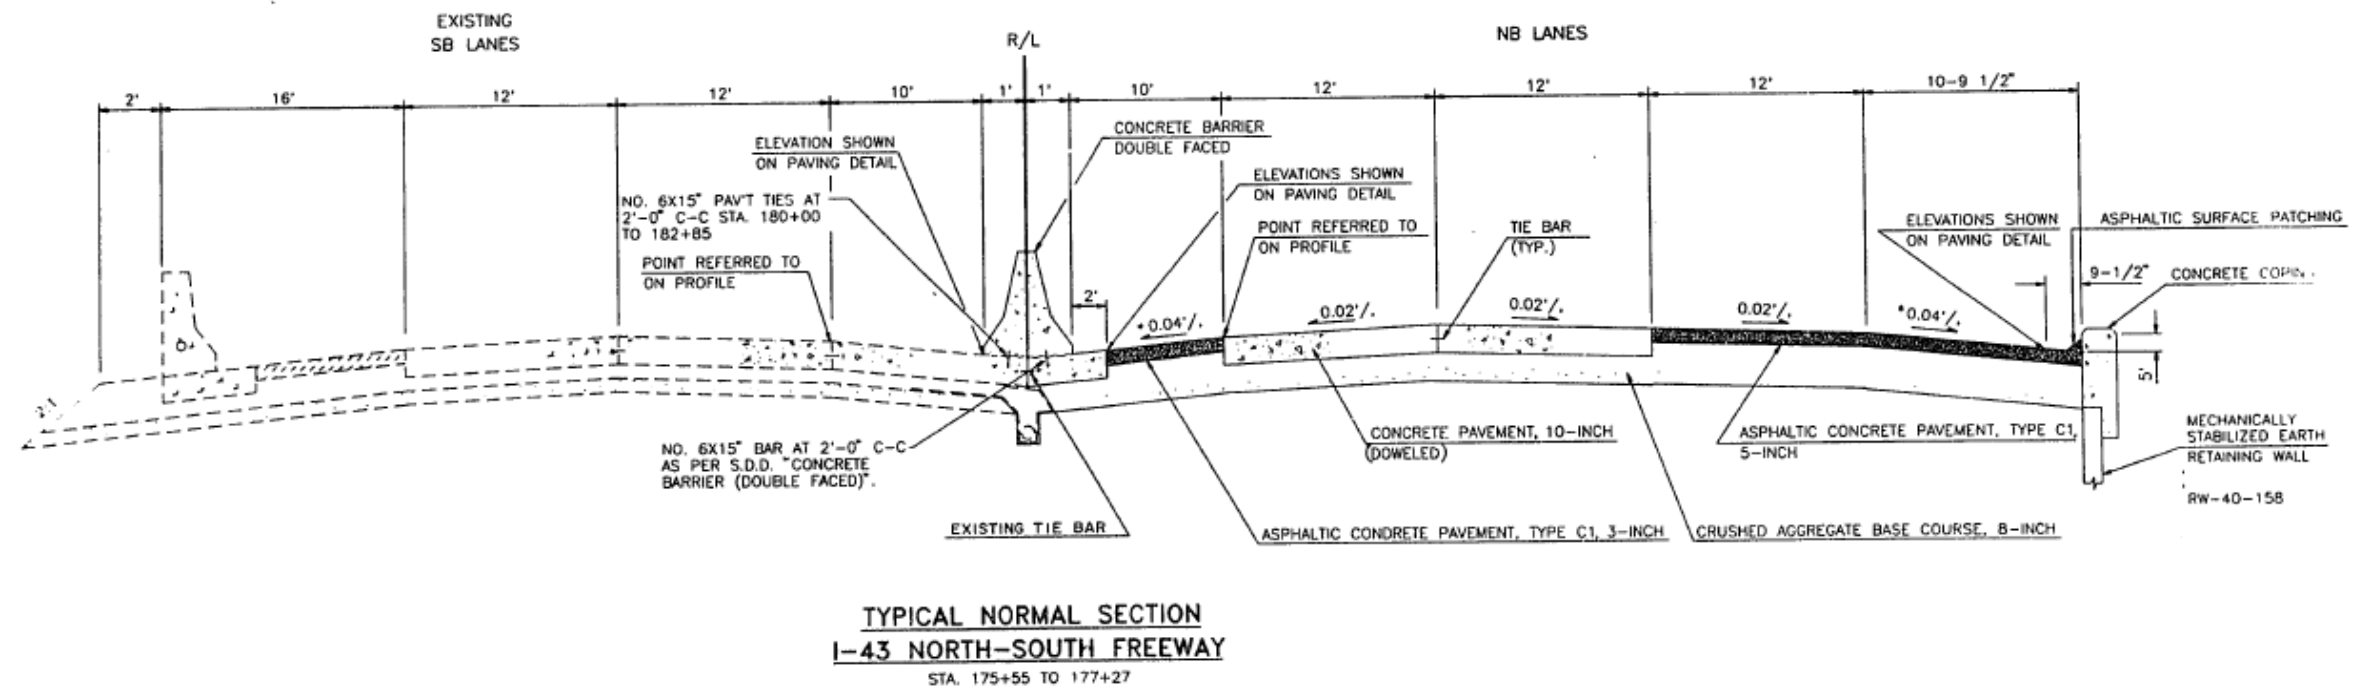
Typical section of the I-43 highway beyond the bridge approach slab between stations 175+55 and 177+27.
